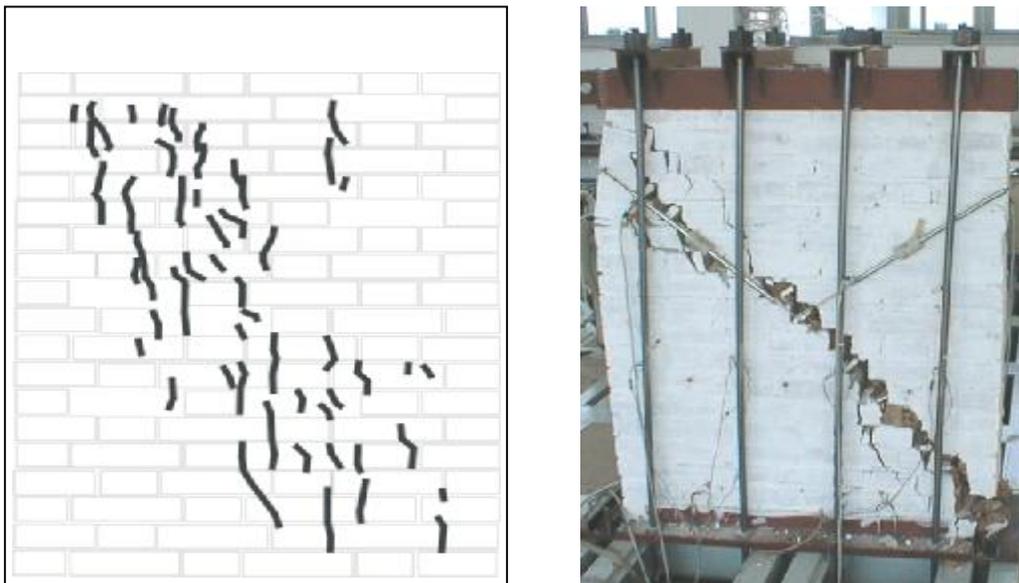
Left - Crack pattern of walls strengthened using polymer grids. Right – A typical shear crack in a plain wall after collapse under a shock horizontal load combined with unevenly distributed vertical stress.
